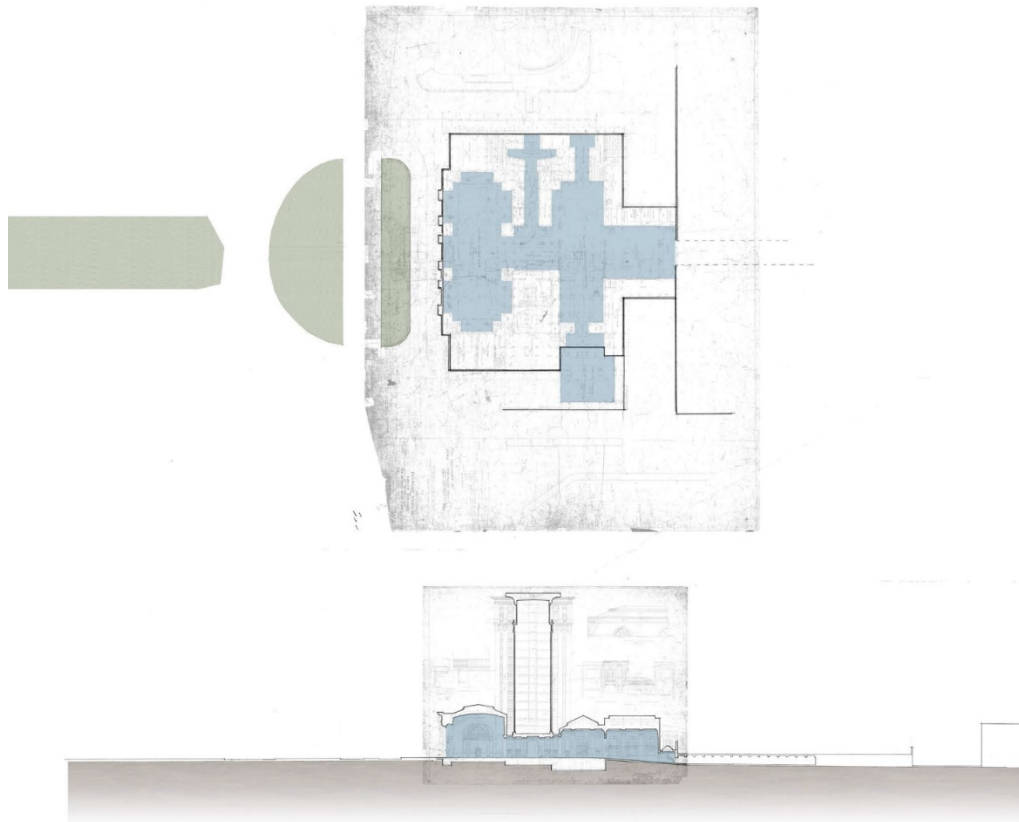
Section & Plan Building Diagrams showing Tower and Plinth spatial conflicts
